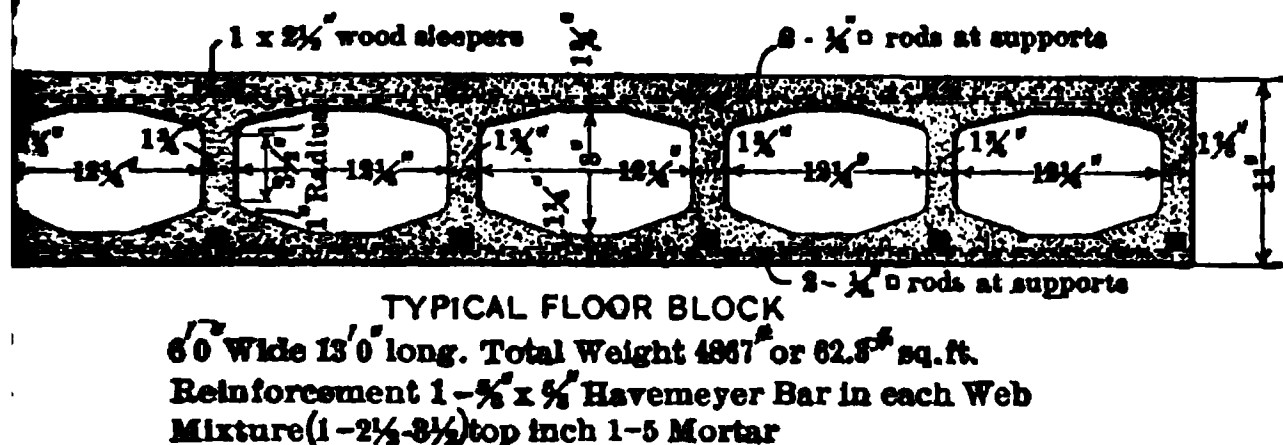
Siegwart Reinforced-concrete Floor-construction
